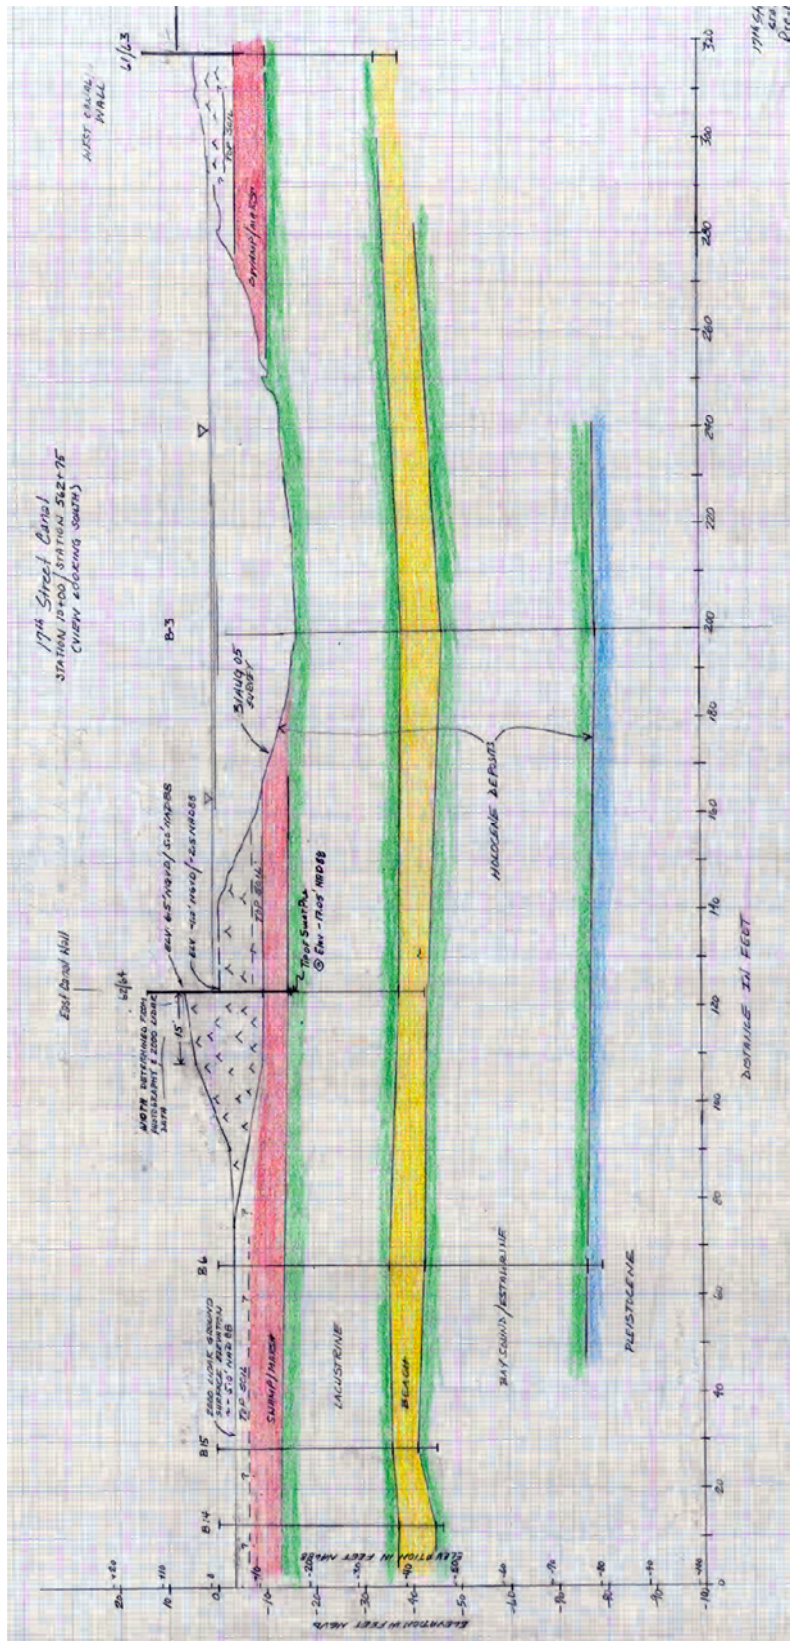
Prefailure Cross-Section at Sta 10+00 (New Stationing) / Sta. 562+75 (GDM Stationing)
